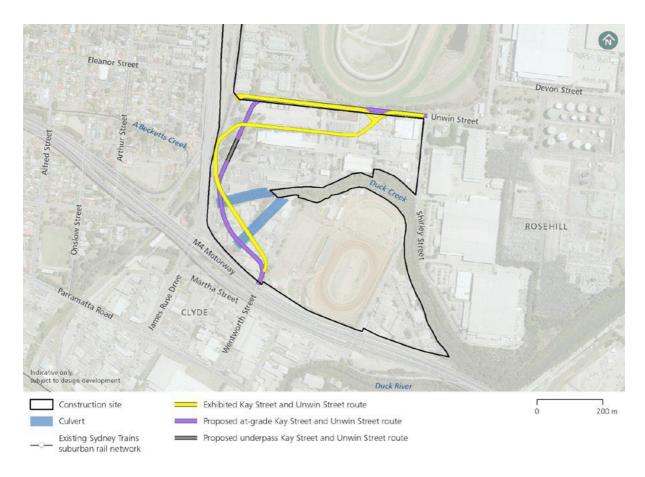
| Proposed permanent road changes at Clyde stabling and maintenance facility construction site and Camellia (Source: Amendment Report)
